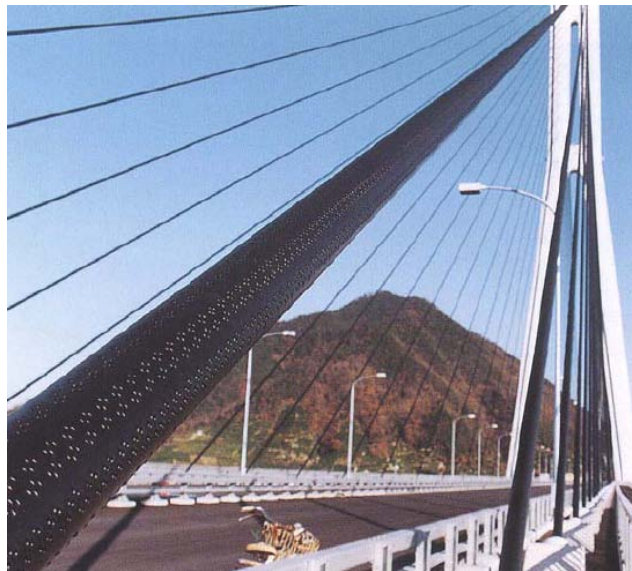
Indented surface used on the Tatara Bridge (Sun et al., 2010)
